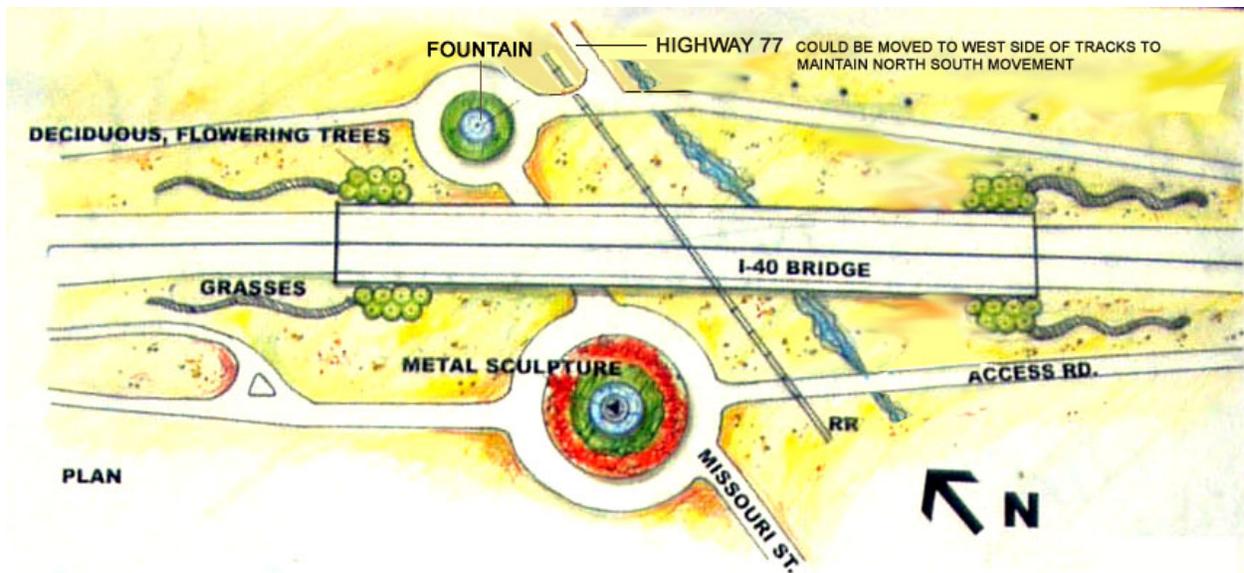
Landscape Architecture student preliminary study of double roundabout replacing existing intersection. The railroad crosses one leg of each roundabout which is preferred over the above solution but does not resolve excessive queuing on existing access/exit roads due to an increasing number of long slow trains. Shawn Shrum
